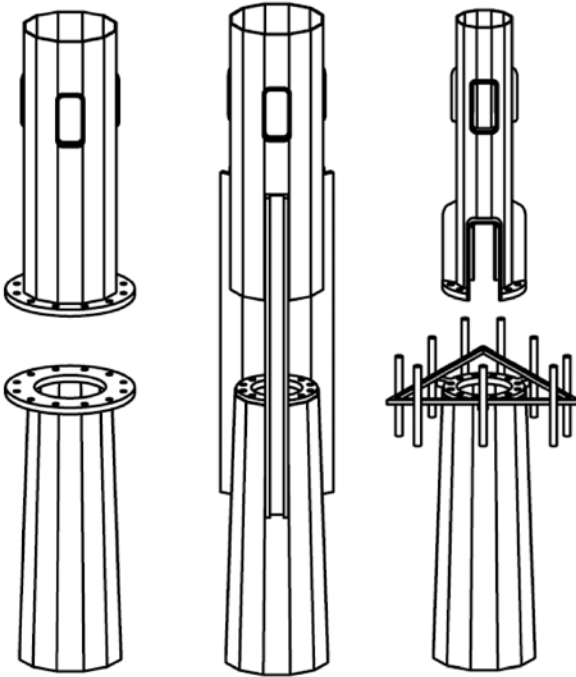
From left: Flange to flange, stilted, and mouse hole connections.
